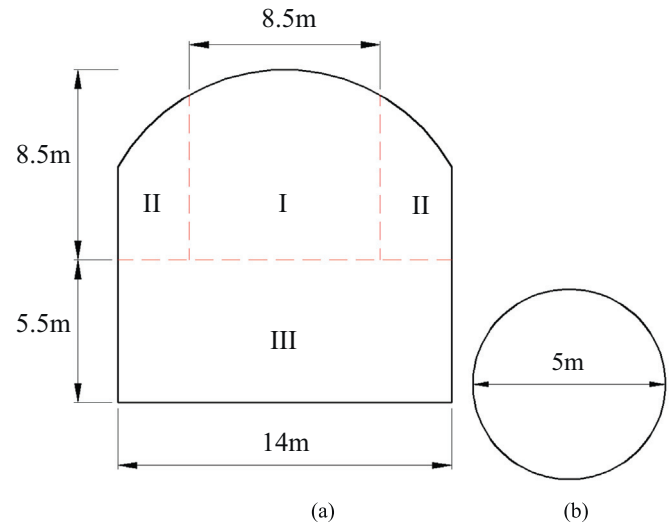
Cross-sections and excavation stages at CJPL-II. (a) Cross-section of the 1#~8# Labs. (b) Cross-section of the 9-1# Lab.
